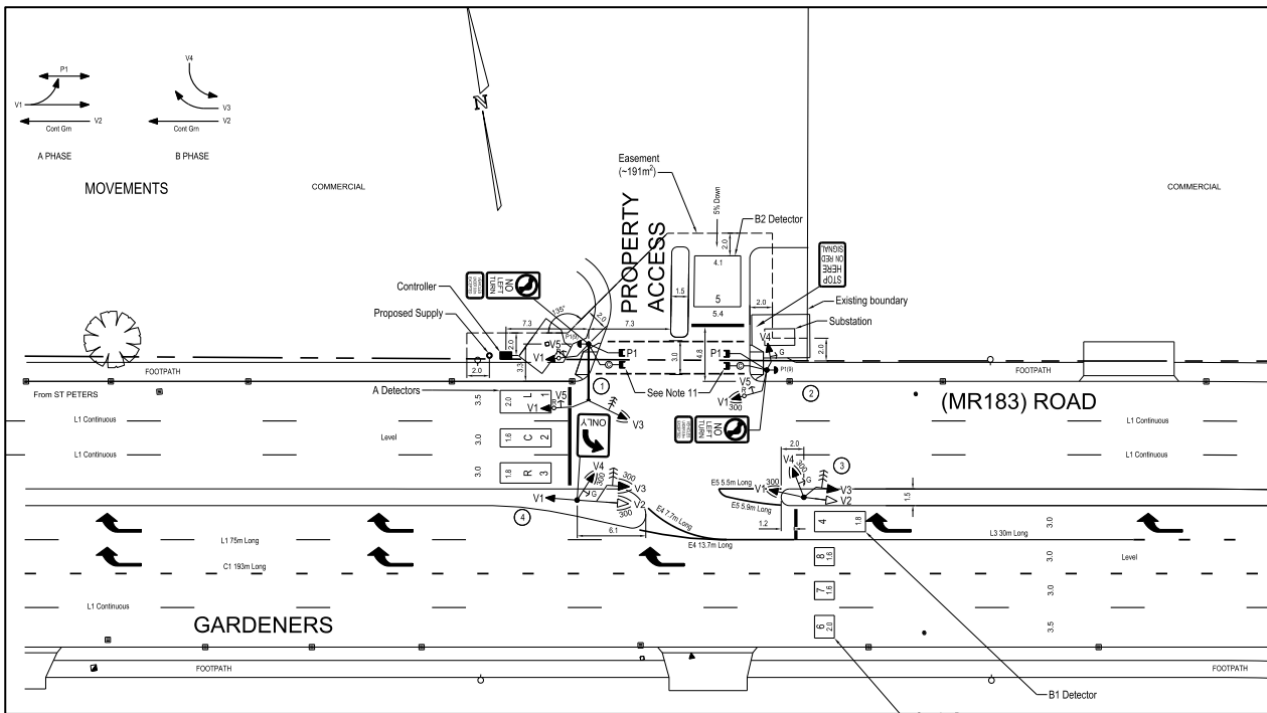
Gardeners Road and Site Access TCS Diagram (TCS 4944)
